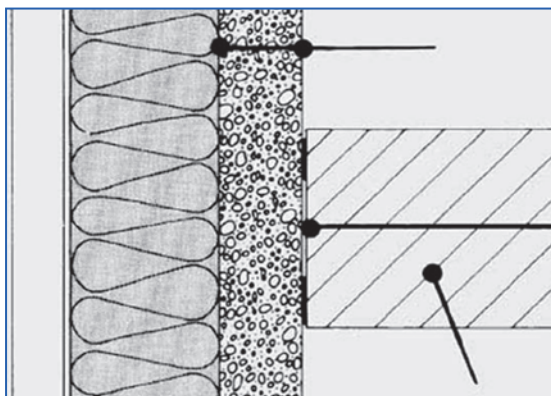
Leakages due to missing sealing between prefabricated concrete elements. Wrong dimensions of walls and floors can also result in unexpected flanking transmission.
